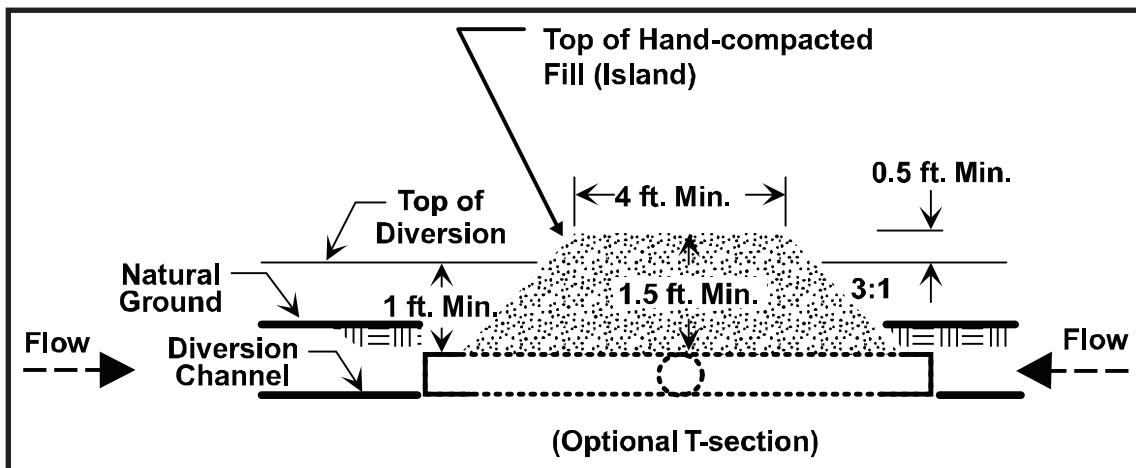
Detail of Inlet to a Temporary Slope Drain
